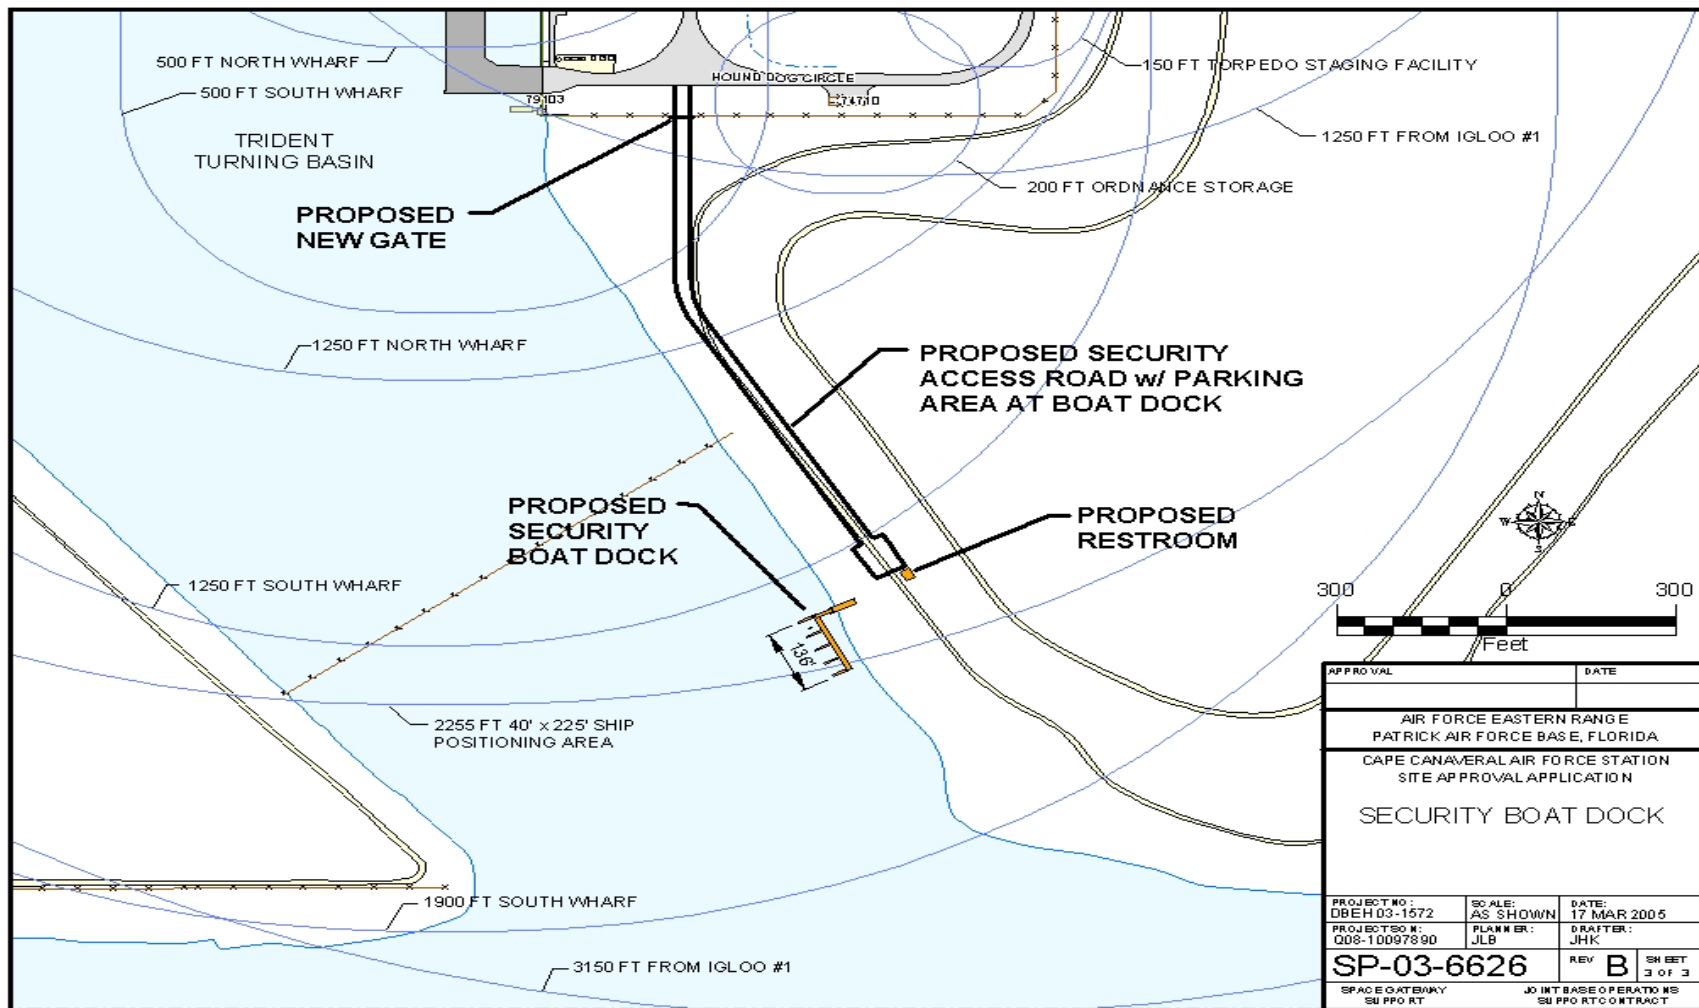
PROPOSED NEW FLOATING DOCK LOCATED AT CCAFS
